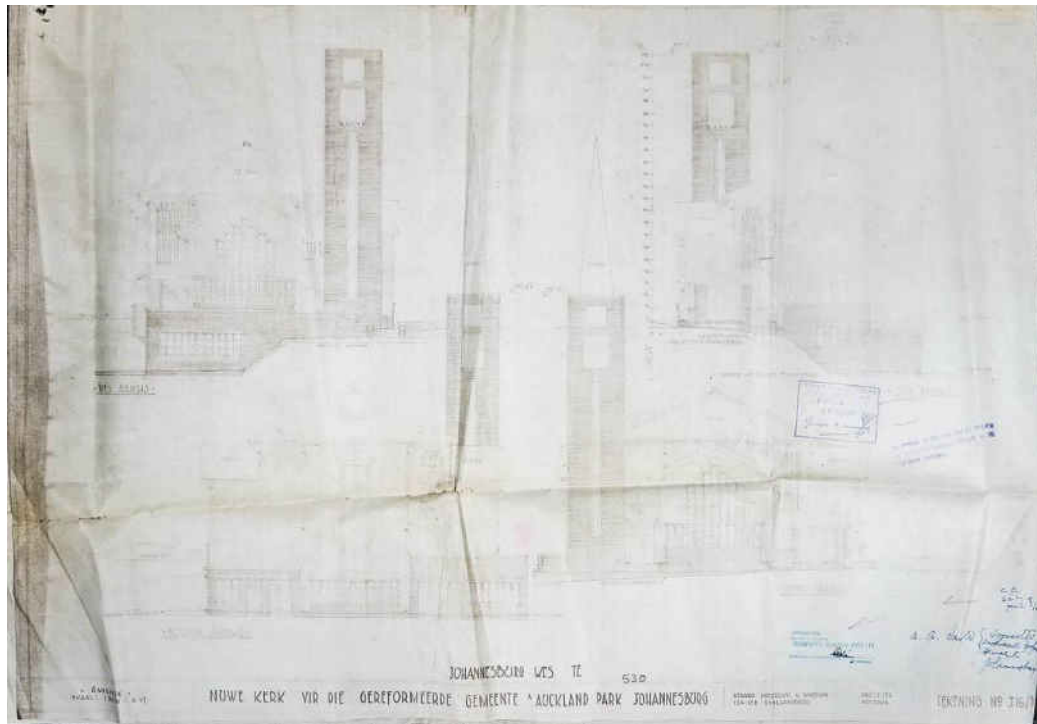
Original elevation plan for the Nuwe Kerk vir die Gereformeerde Gemeente Auckland Park from 1934
